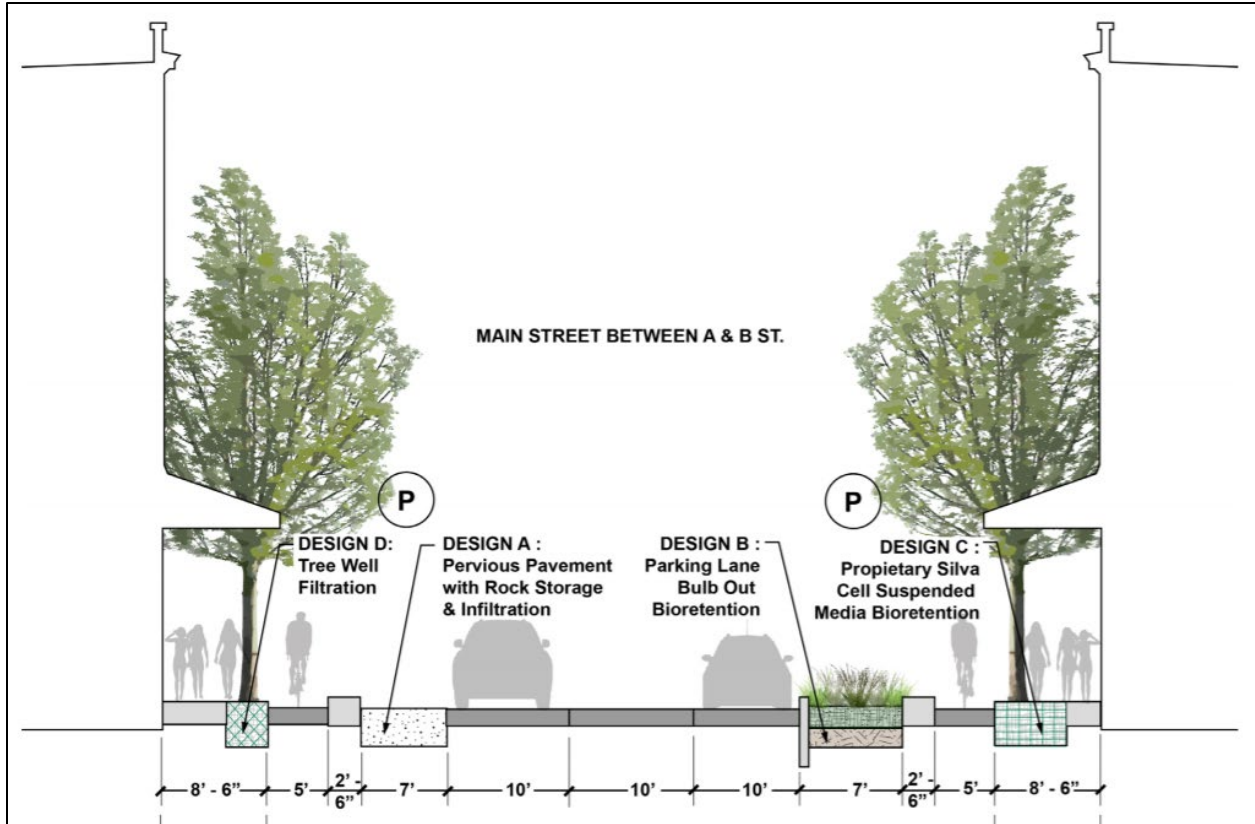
Downtown Hayward Main Street Typical Section. The typical section for Main Street in Downtown Hayward is a 76-foot right-of-way with a mirrored section of 8.5-foot sidewalk, 5-foot bike lane, 2.5-foot passenger landing, 7-foot parking area and a 10-foot traveled lane. In addition, there is a middle 10-foot two-way turning lane. This section assumes a crowned roadway with the high point in the center of the turning lane.
